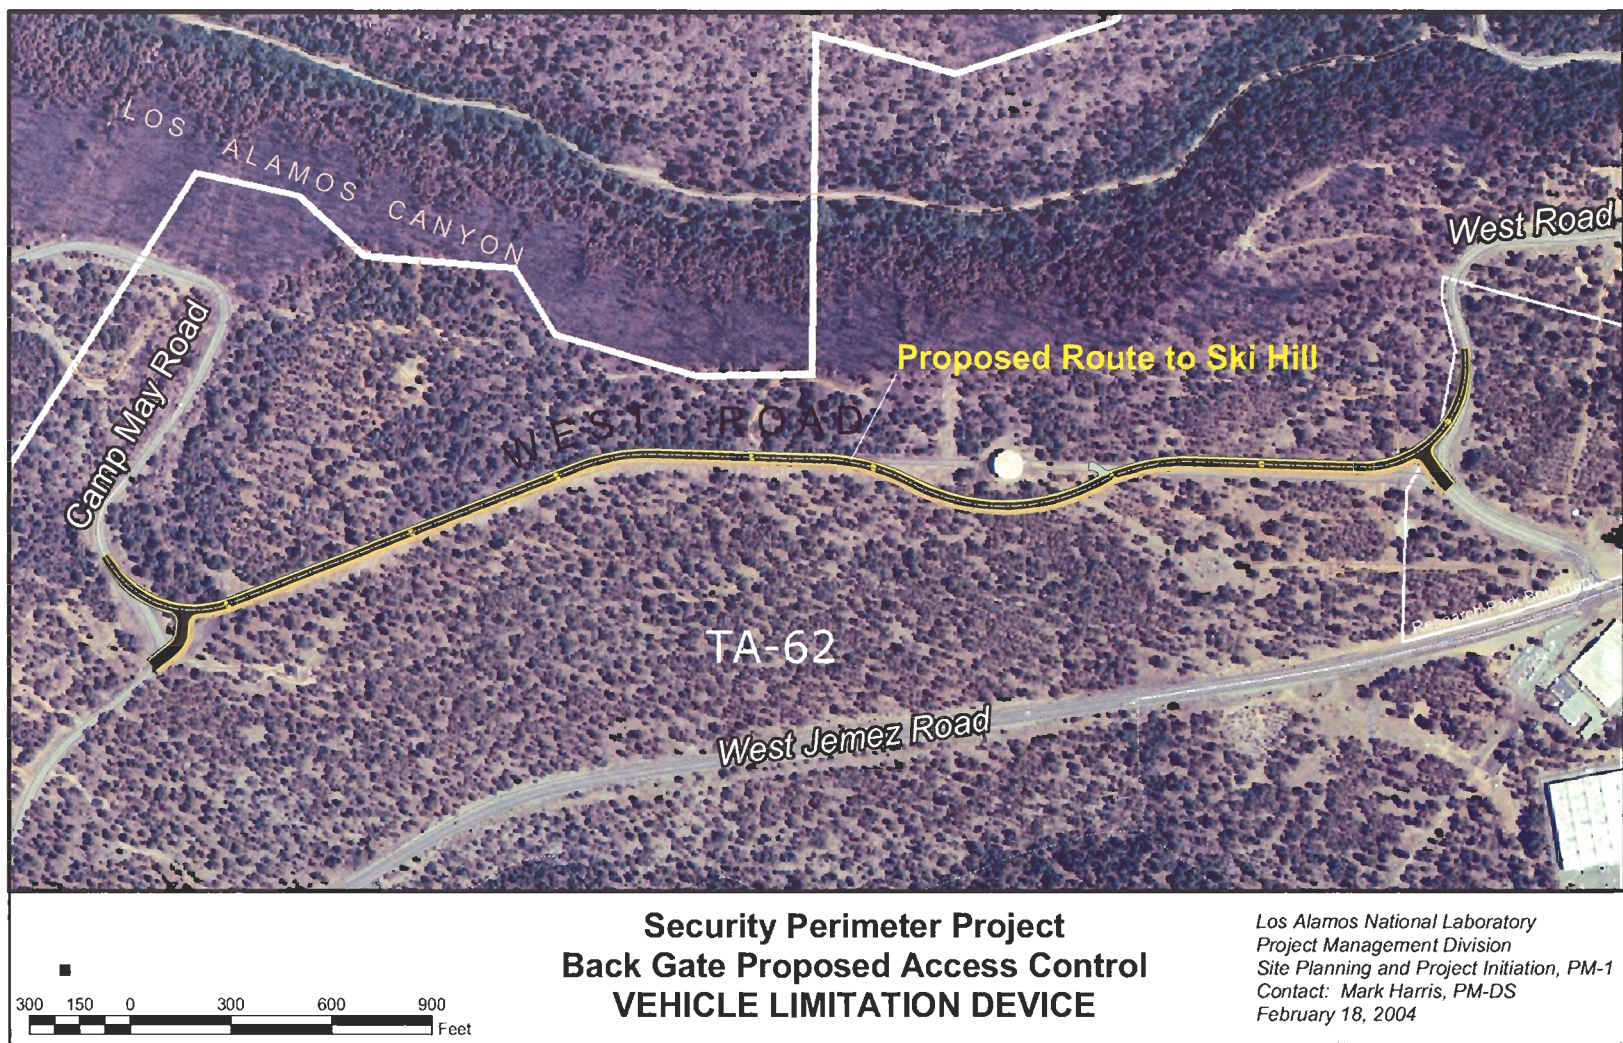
An existing unpaved road would be improved to connect the Ski Hill Road (Camp May Road) with West Road.
